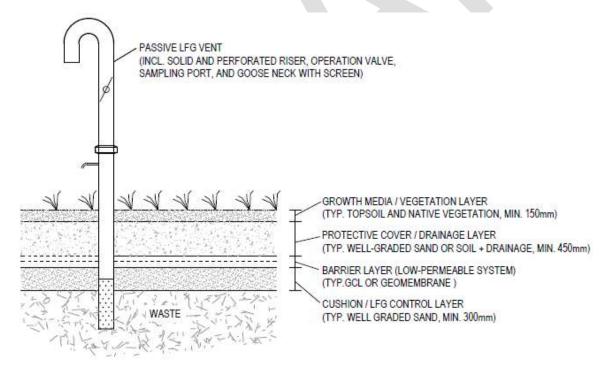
Drawing detail for typical low-permeable system with GCL or geomembrane.
